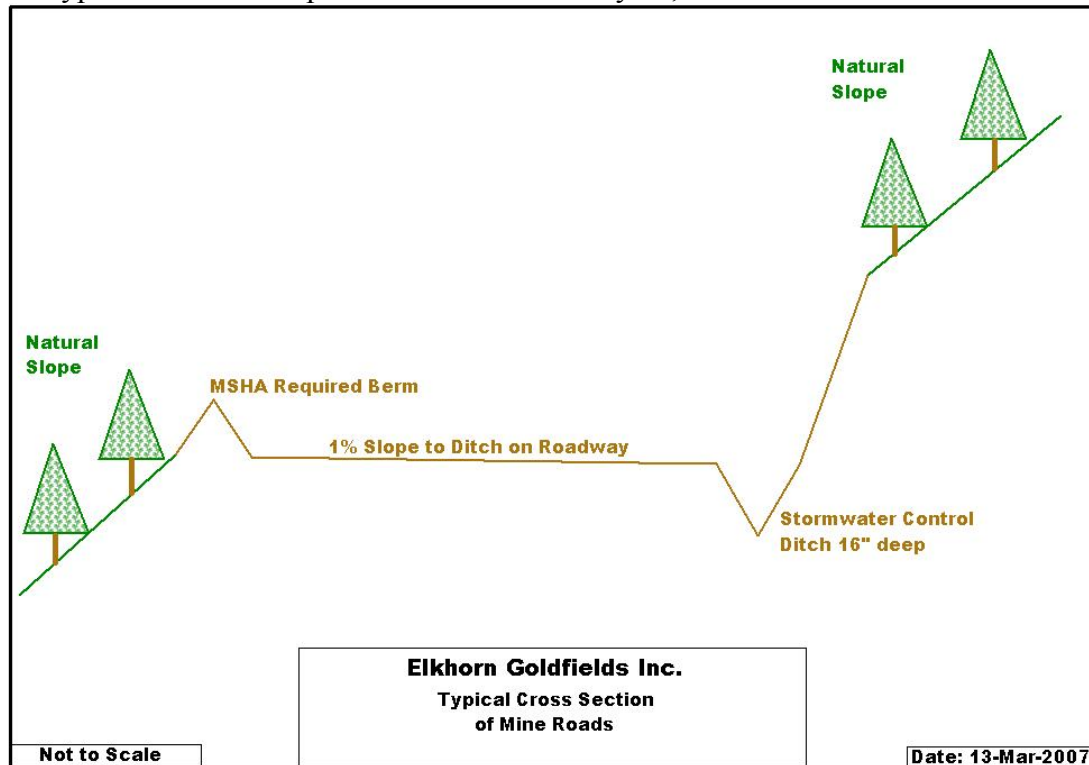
Schematic Cross-Section of Typical Mine Road with Stormwater Control Ditch.
